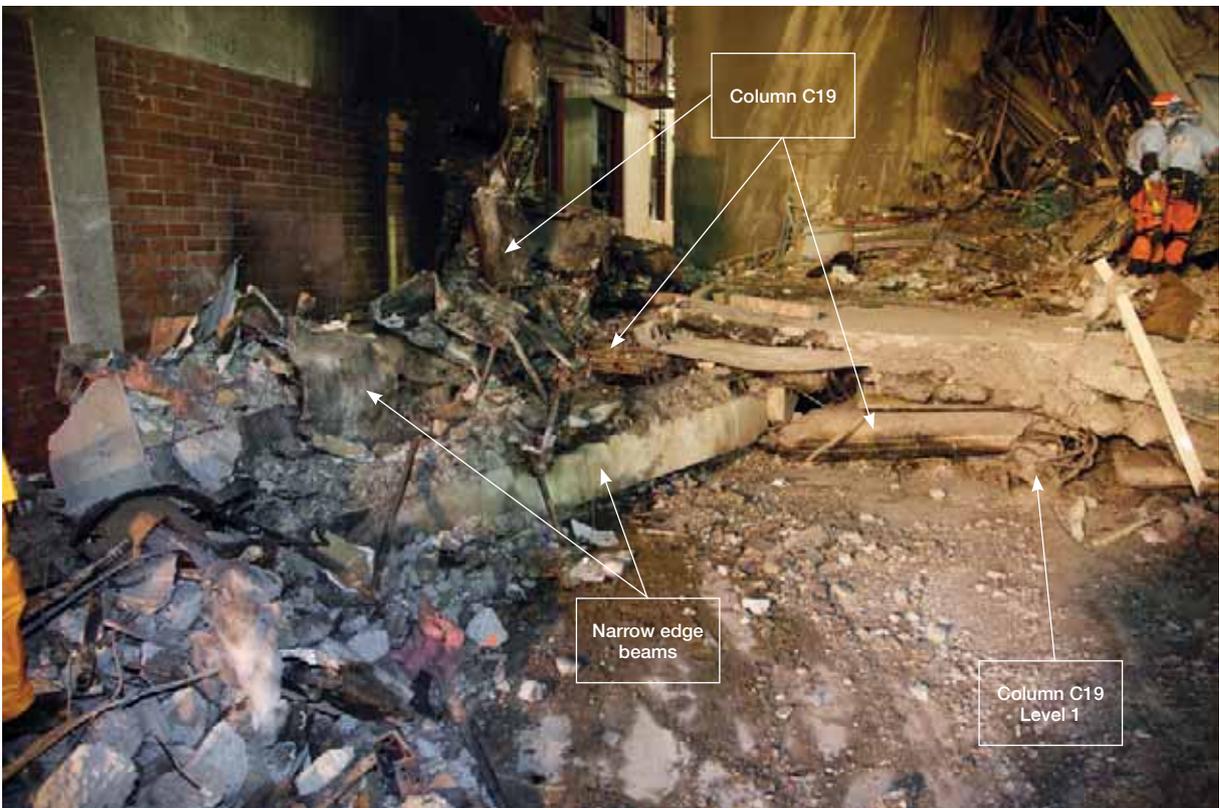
(f): View of the north-west corner looking towards the north wall complex (source: Robert Heywood)
